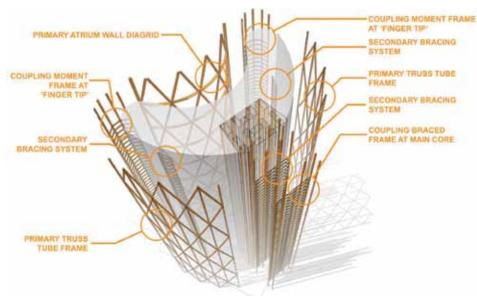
Exploded view of lateral load resisting structure. © Yolles
